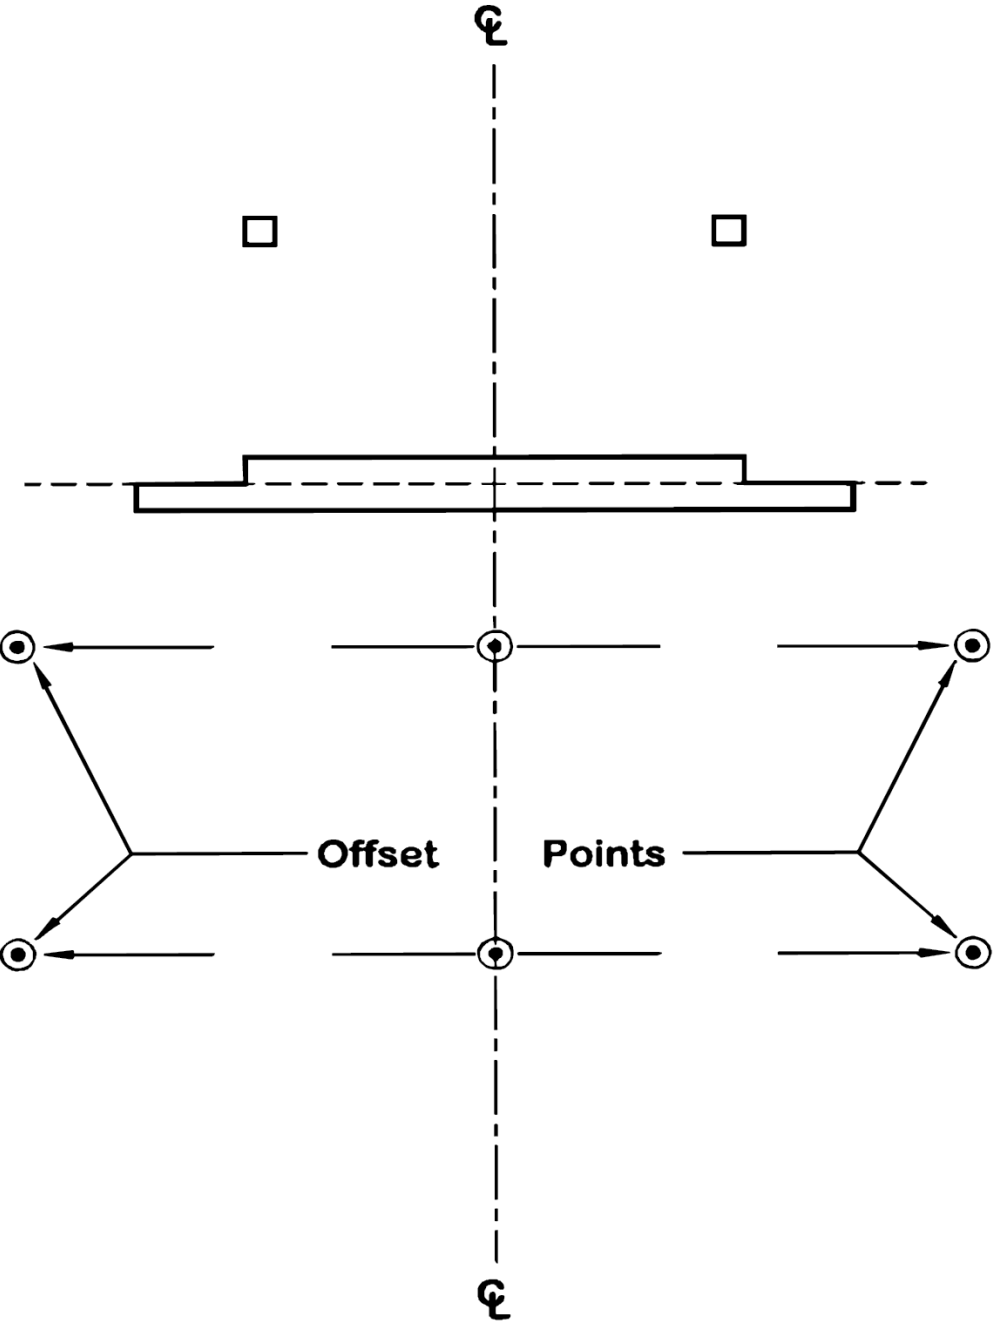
Permanent Points for Bridge and Box Culvert Staking
